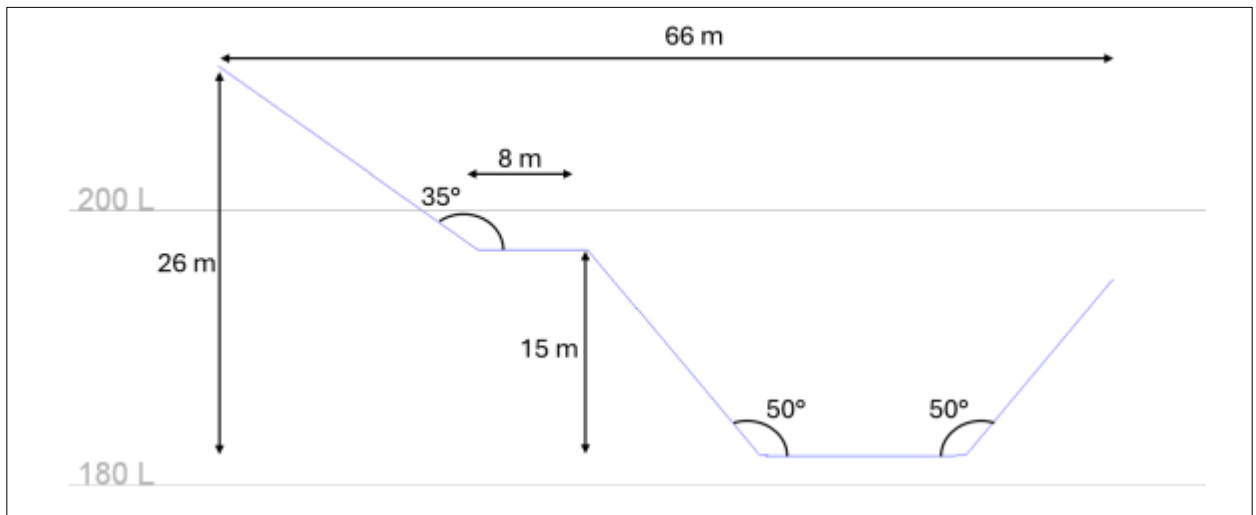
Schematic southern side wall design geometry (Source: Waihi North Project - Willows Preliminary Box Cut Design Memo, PSM).
